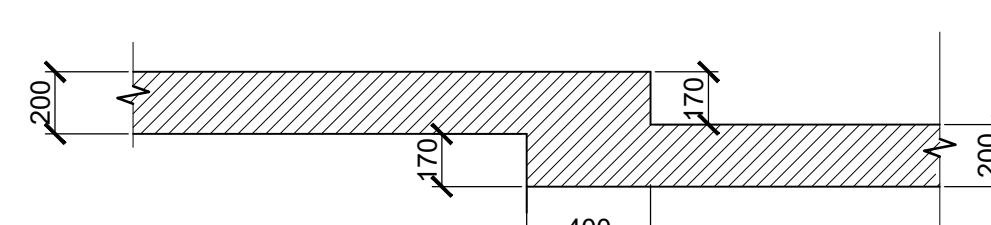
DETAIL A - NEW WALL PANEL TYPE 5 TO EXISTING WALL
